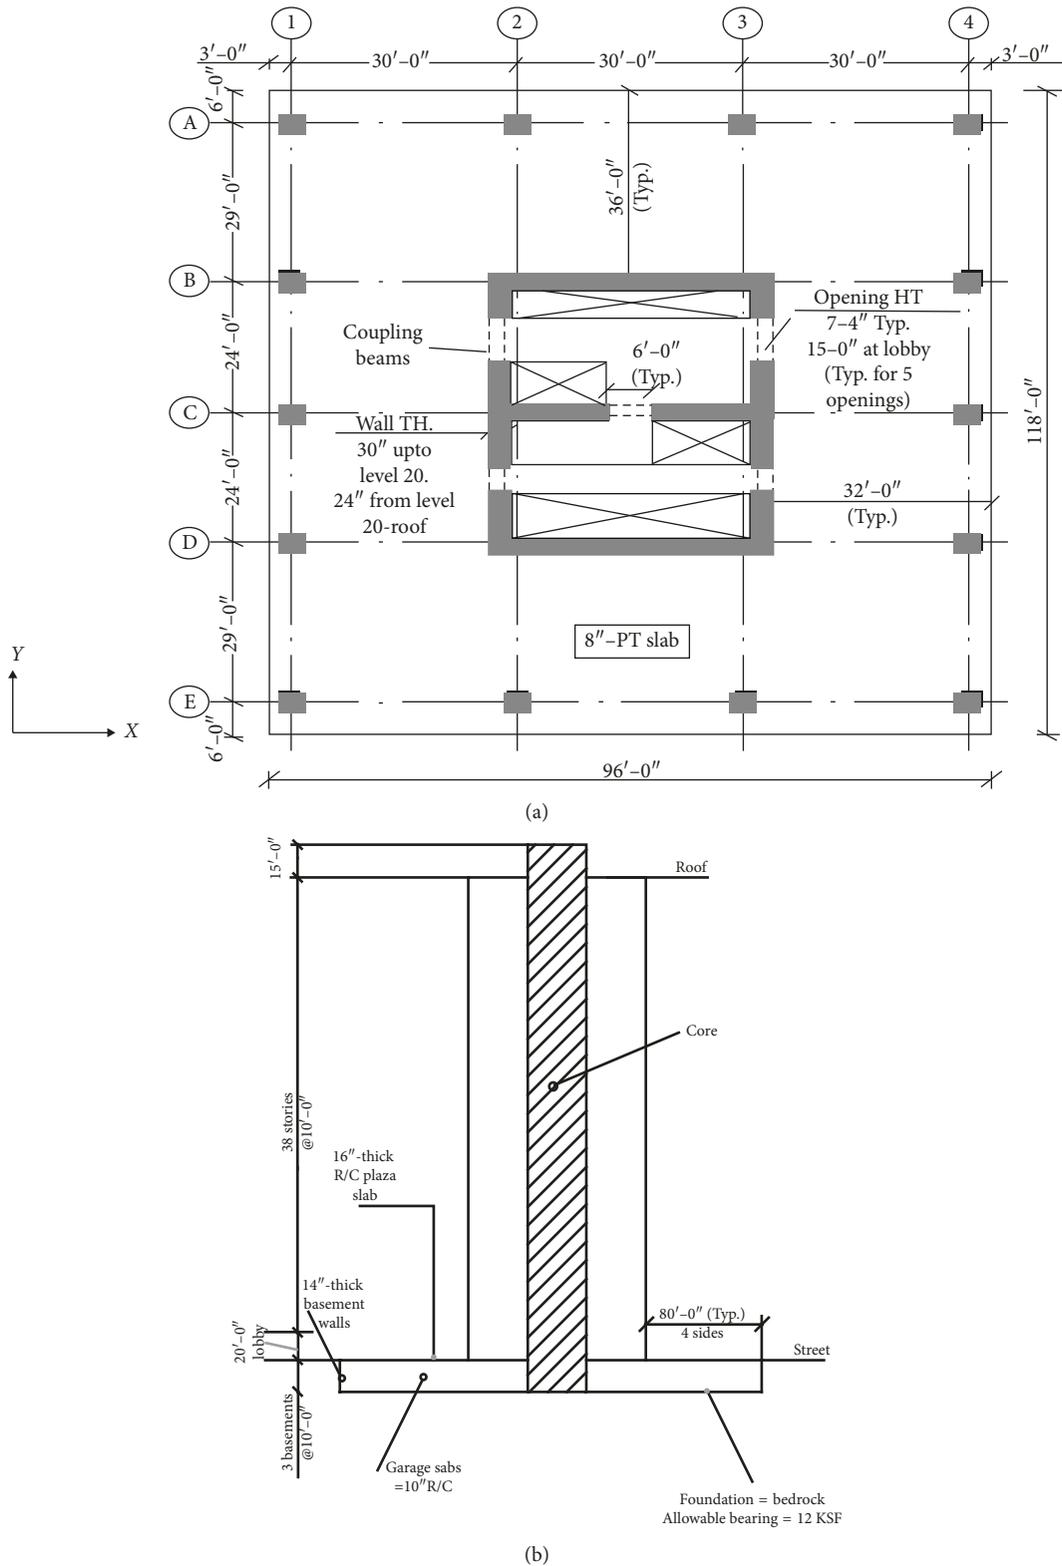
(a) Plan view of 40-story building [24, 25]; (b) elevation of 40-story building [24, 25].
